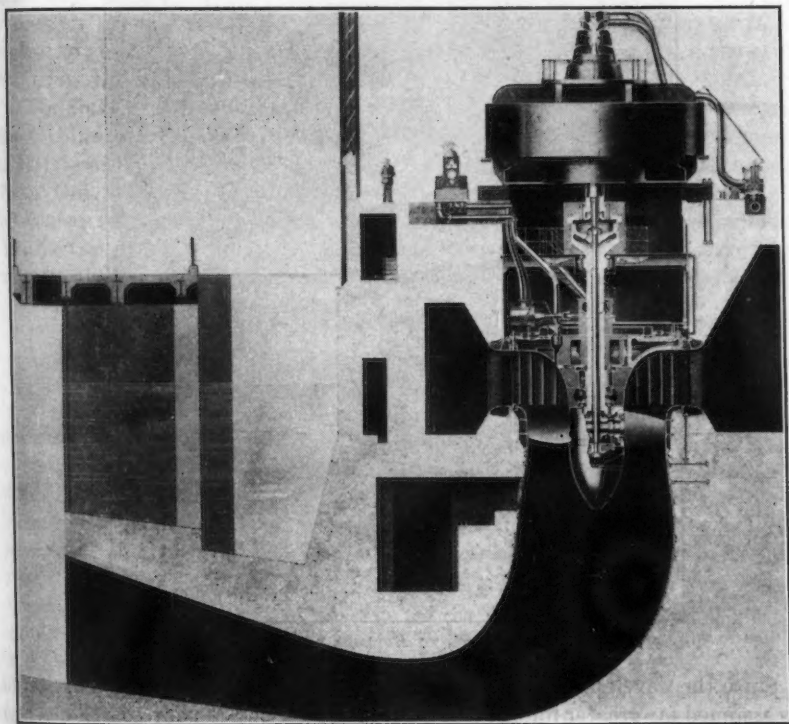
SECTIONAL ELEVATION OF 42 000-HP TURBINE, SAFE HARBOR PLANT,
